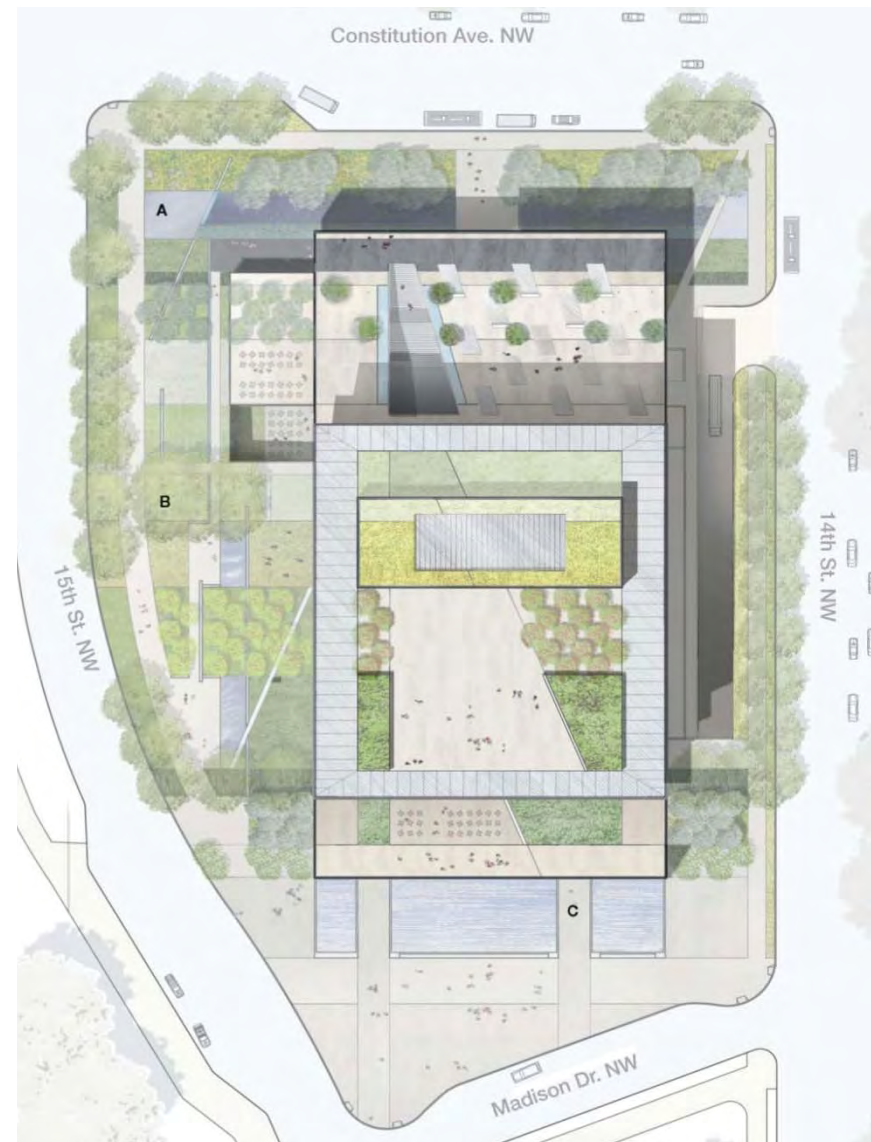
Fragmented Plinth Scheme: Ground Floor Plan
